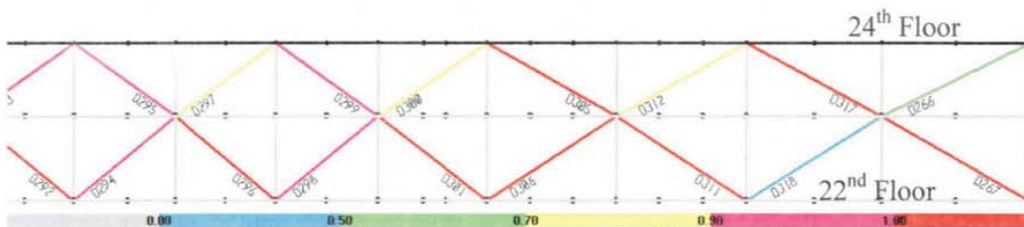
North Belt Truss diagonal diagram (Building west side magnified)
